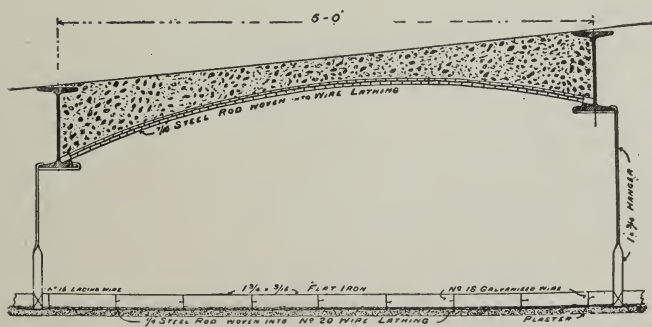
Concrete Arch Roof Construction and Hung Ceiling.
